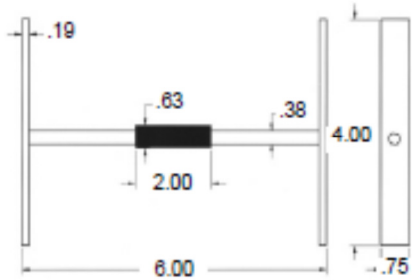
ASG and EPC Installation Locations (all units in metres)
